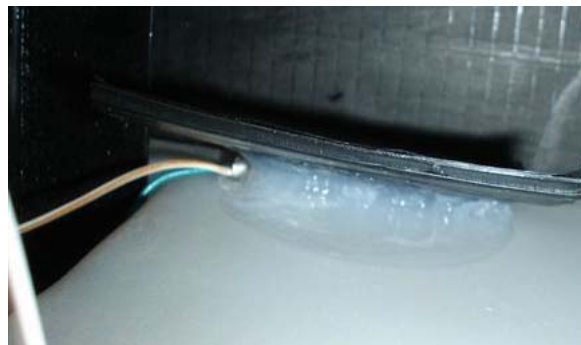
Install the 4” x 6” piece of corrugated underbelly material over the exposed probe.
